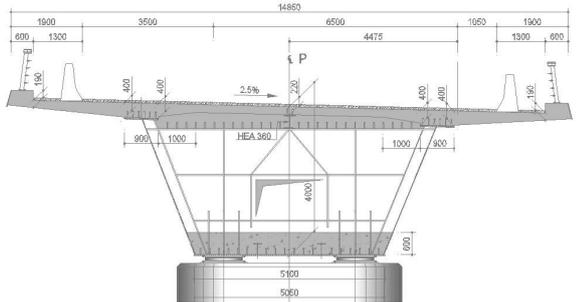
Case study #2: cross-section over piers – alternative B [5]
